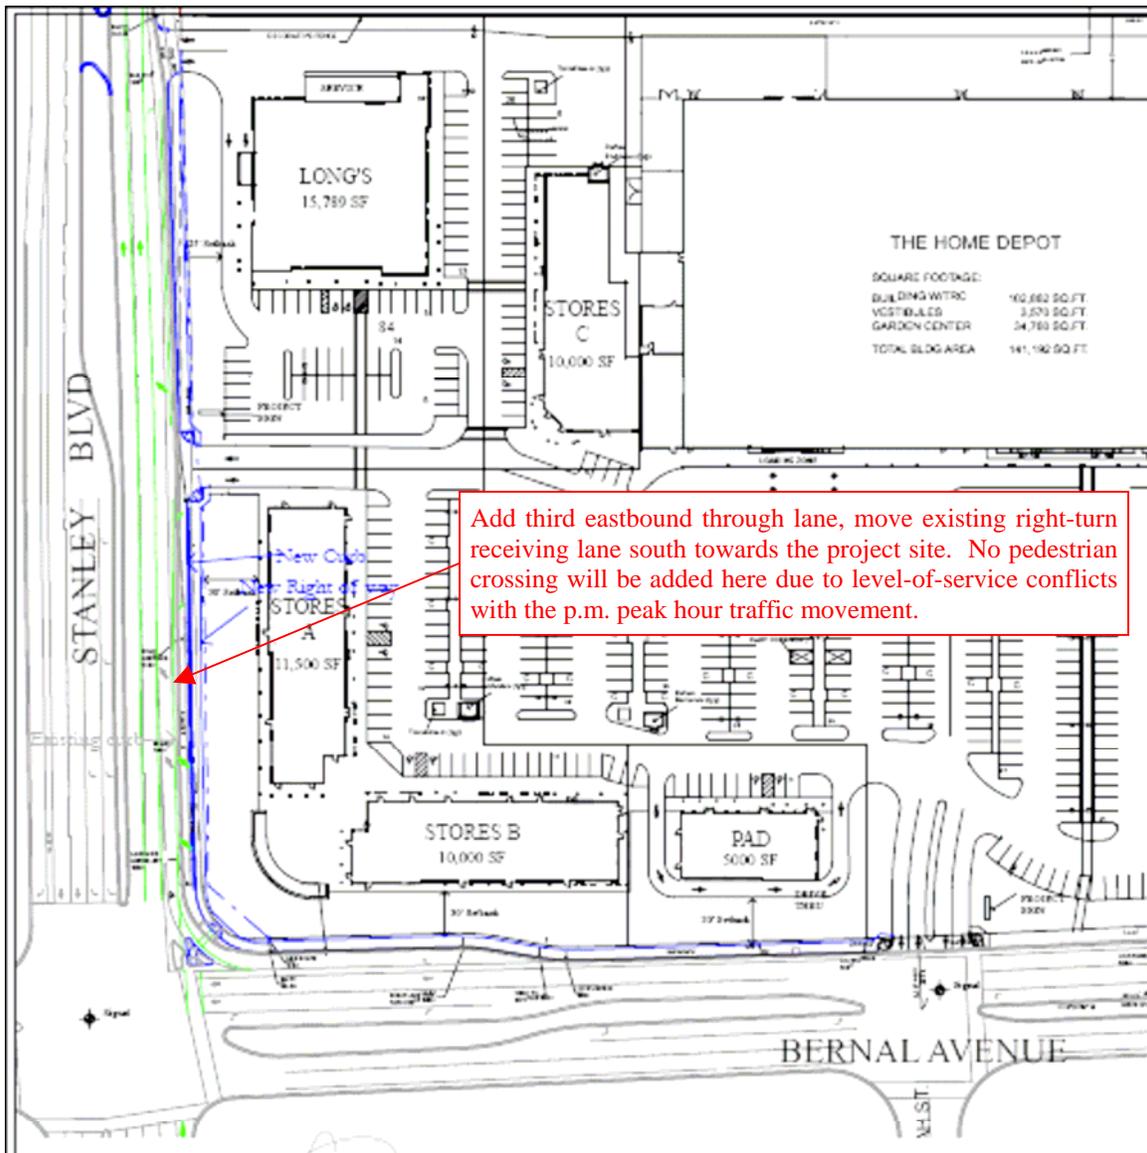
Stanley Boulevard/Valley Avenue/Bernal Avenue Intersection Improvements.
